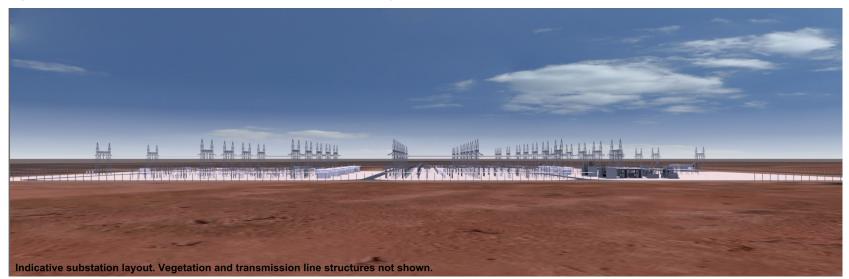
Indicative elevation of the proposed substation, with Arumpo Road located to the left of the image (south-west elevation)
